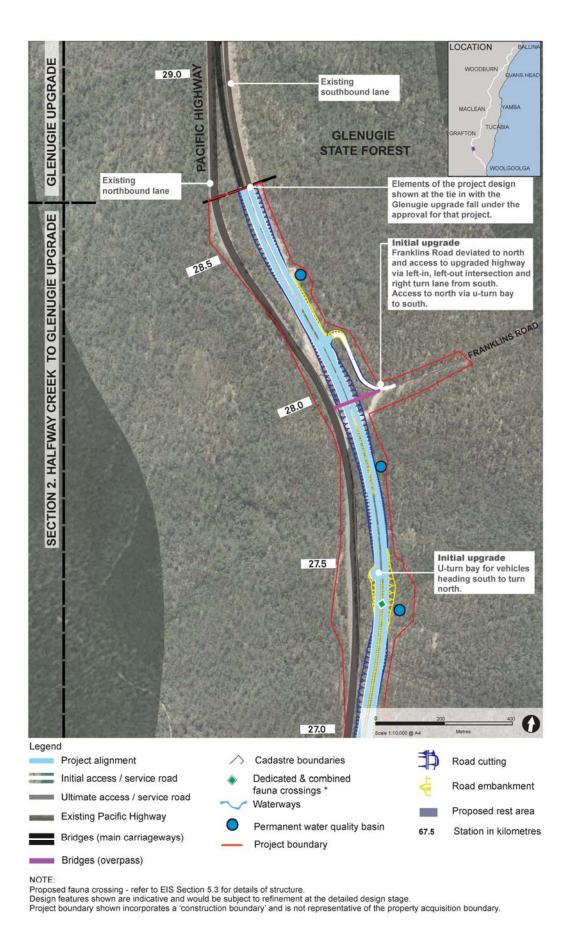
The project - Section 2 (Station 27.0 to 28.7)
